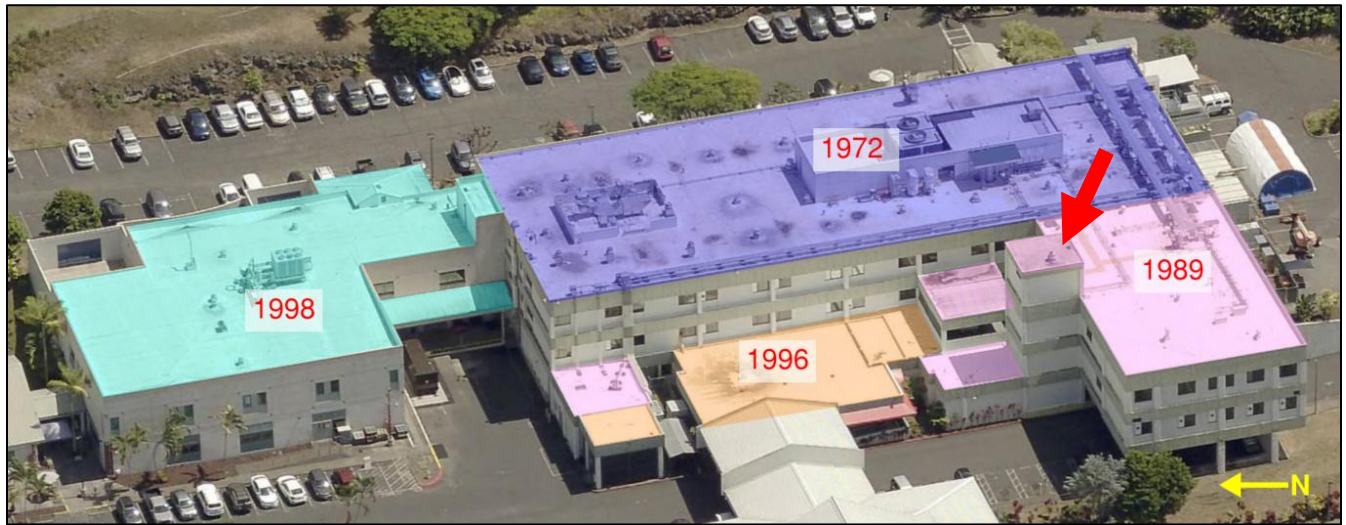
Aerial photo of Building 1 (Main Hospital) with shading and original construction years
